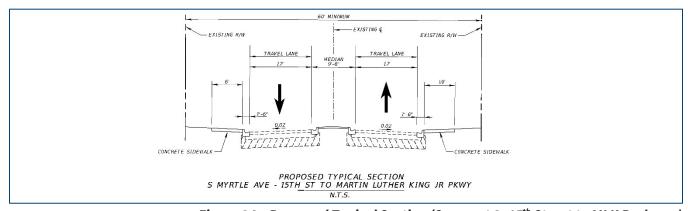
Proposed Typical Section (Segment 3, 15th Street to MLK Parkway)
